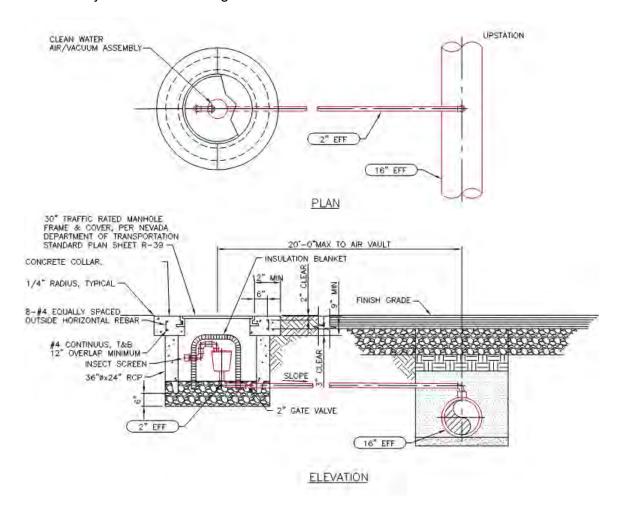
2-inch Air/Vacuum Relief Valve Assembly
